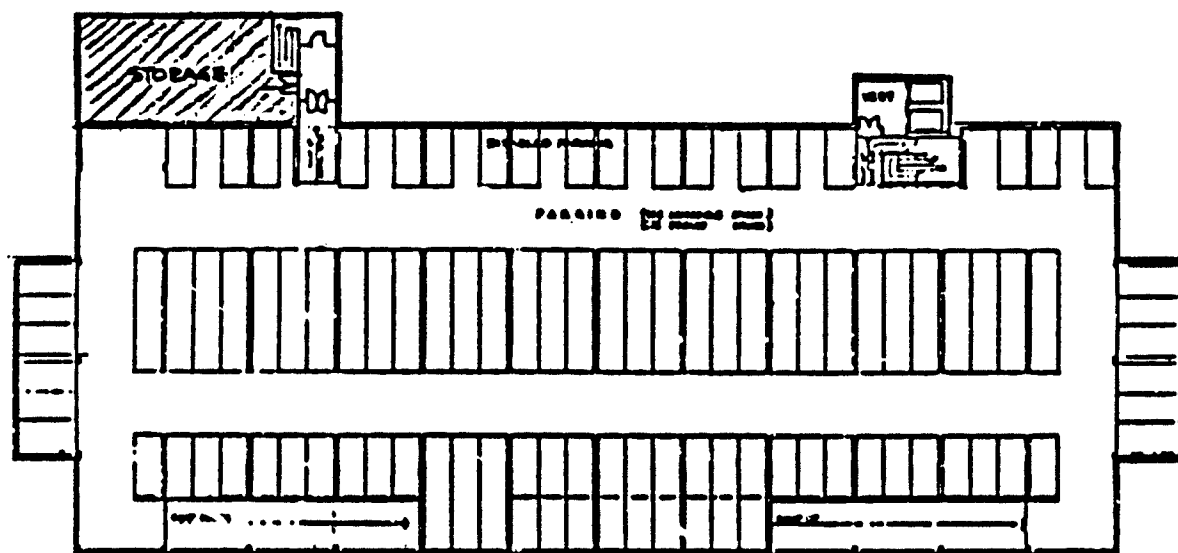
Hospital Alternative #4 -- First Basement Plan
